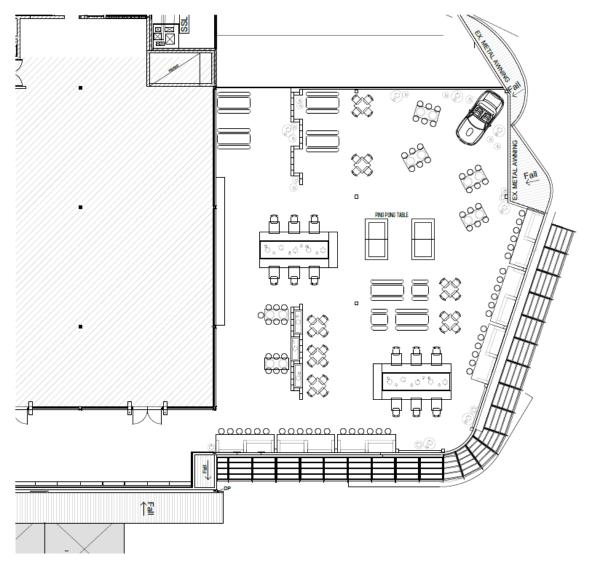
Proposed El Camino terrace seating plan (existing seating excluded)
